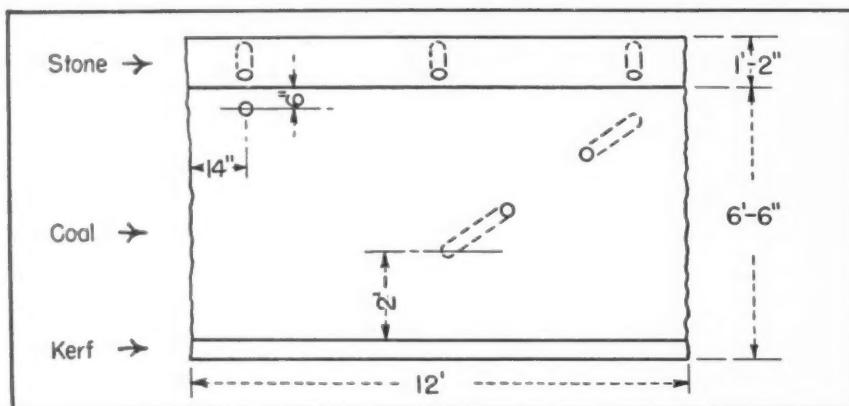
Standard drilling plan for shooting coal and top stone in a 12-ft. heading.
